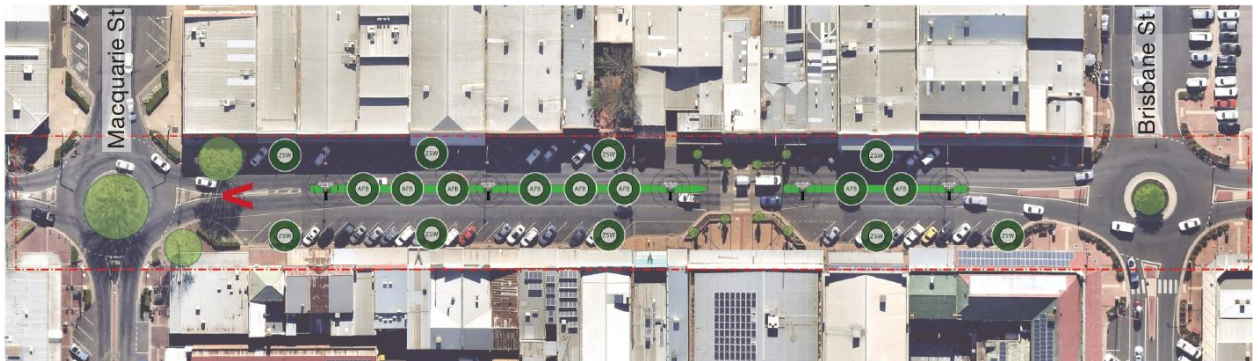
Preliminary tree planting locations, Macquarie Street to Brisbane Street.
